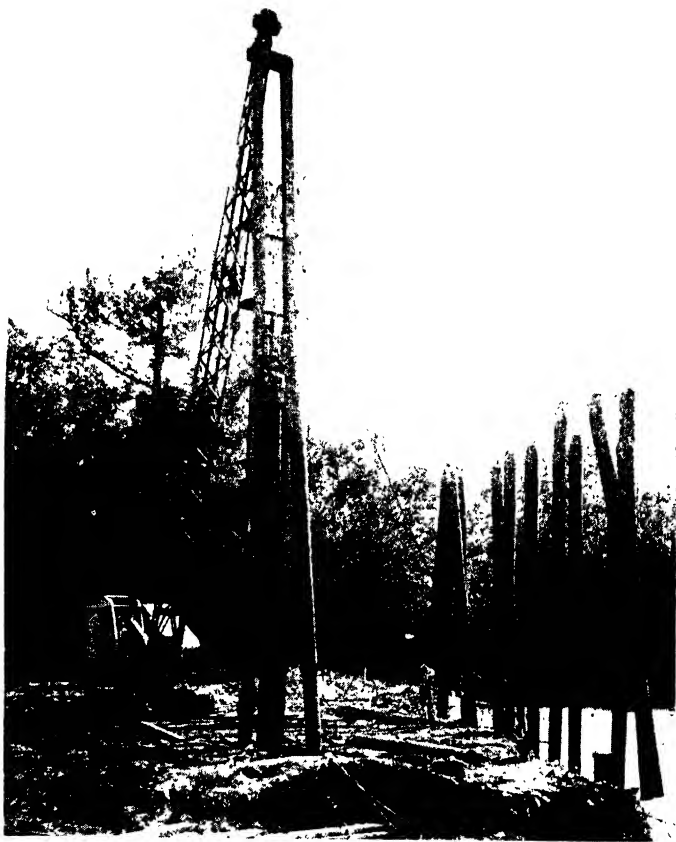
Caterpillar Tractor Crane Assembly Equipped with Timber Hanging Leads.
